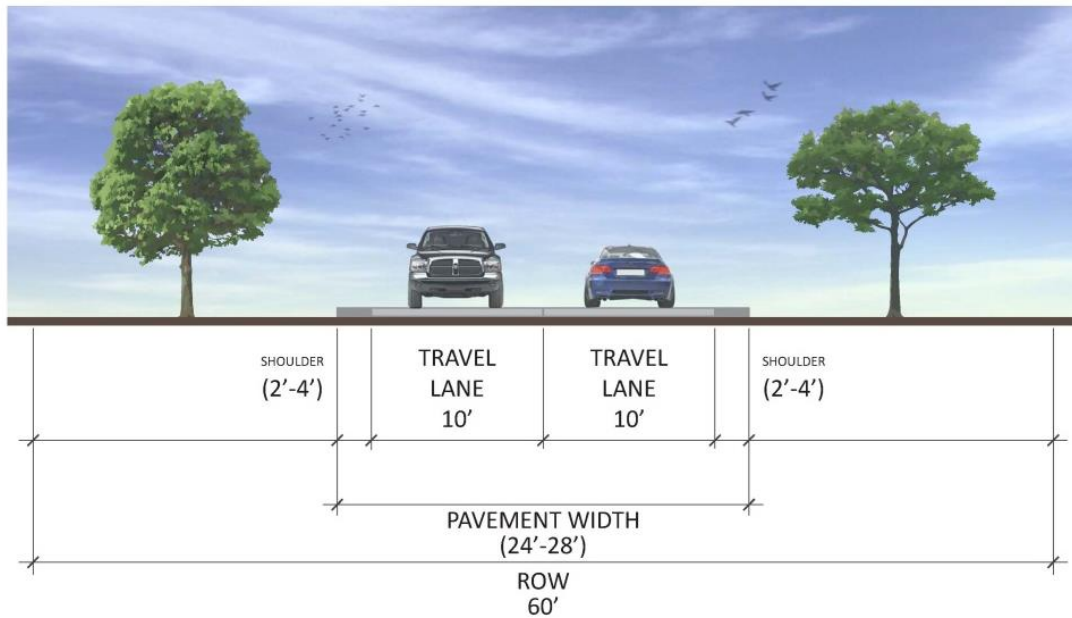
Recommended Rural Local Street Cross-Section
